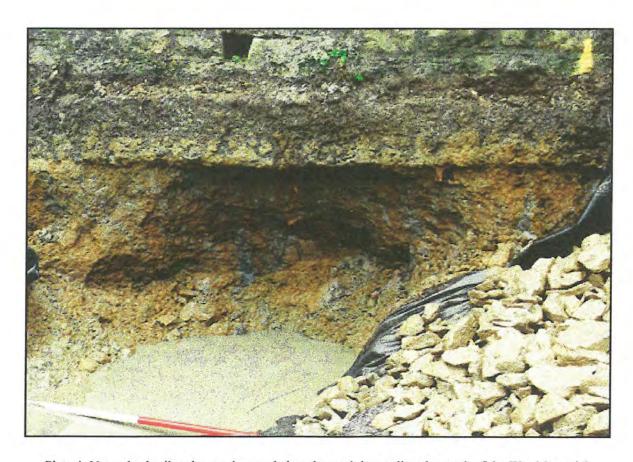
Natural subsoil and water ingress below the retaining wall to the north of the War Memorial
